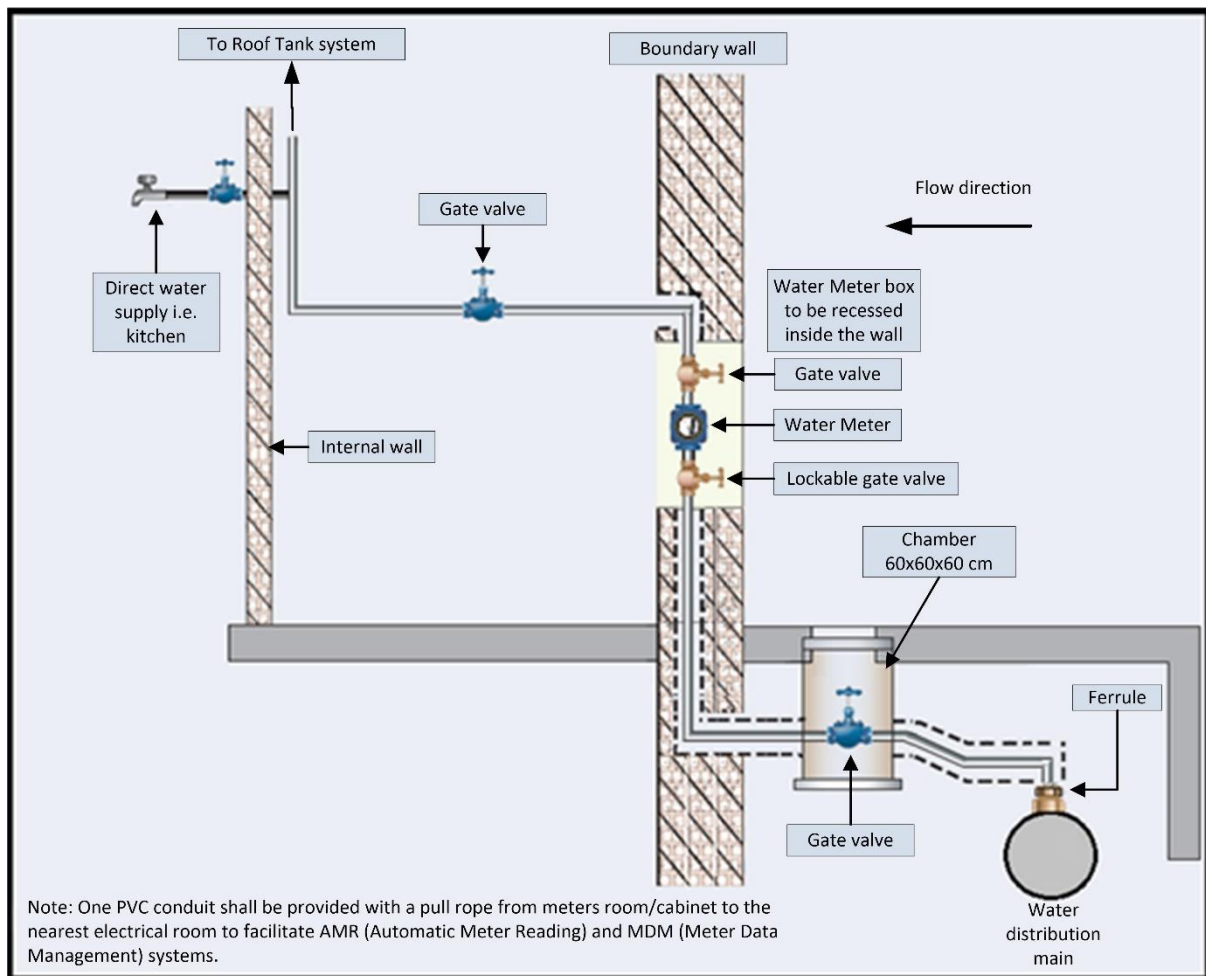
A typical connection arrangement for various connection sizes to a Low-rise Building (single occupancy)
